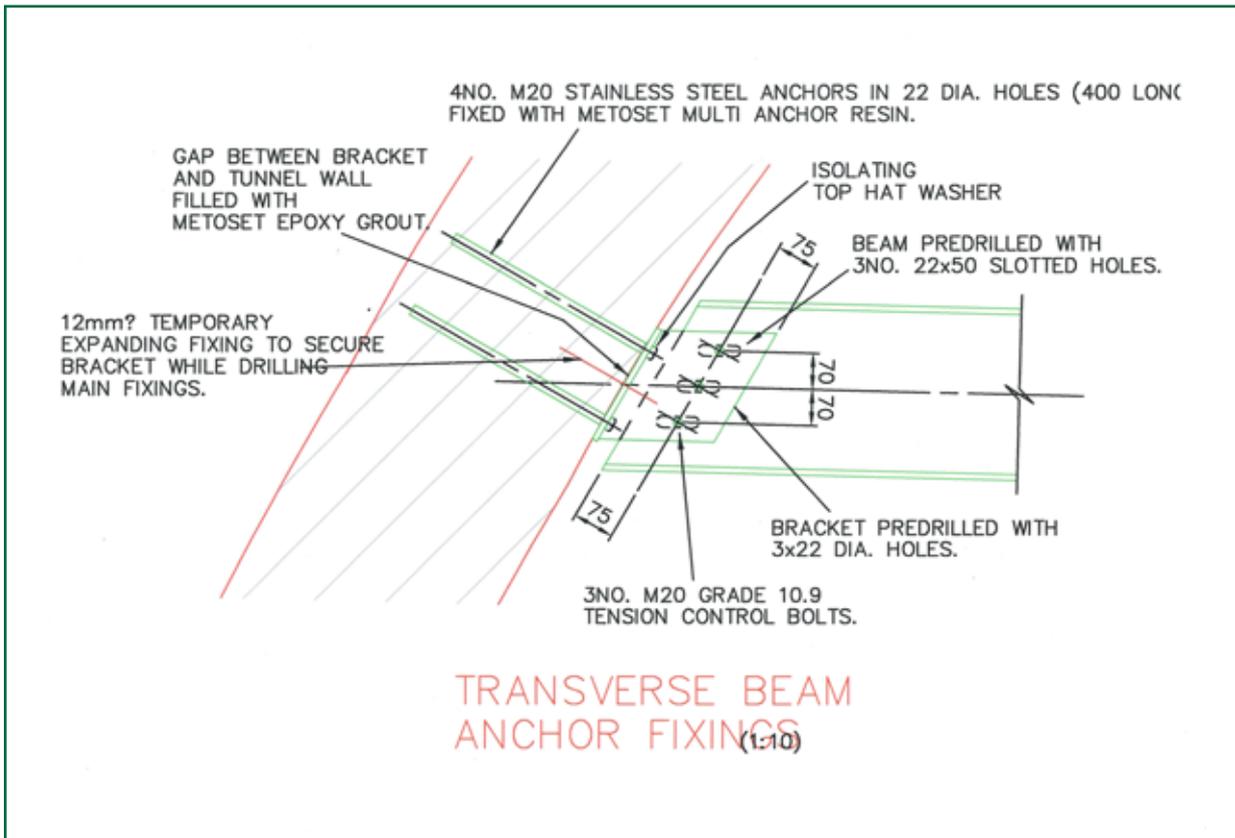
Scott Wilson's design drawing showing transverse beam end fixing
